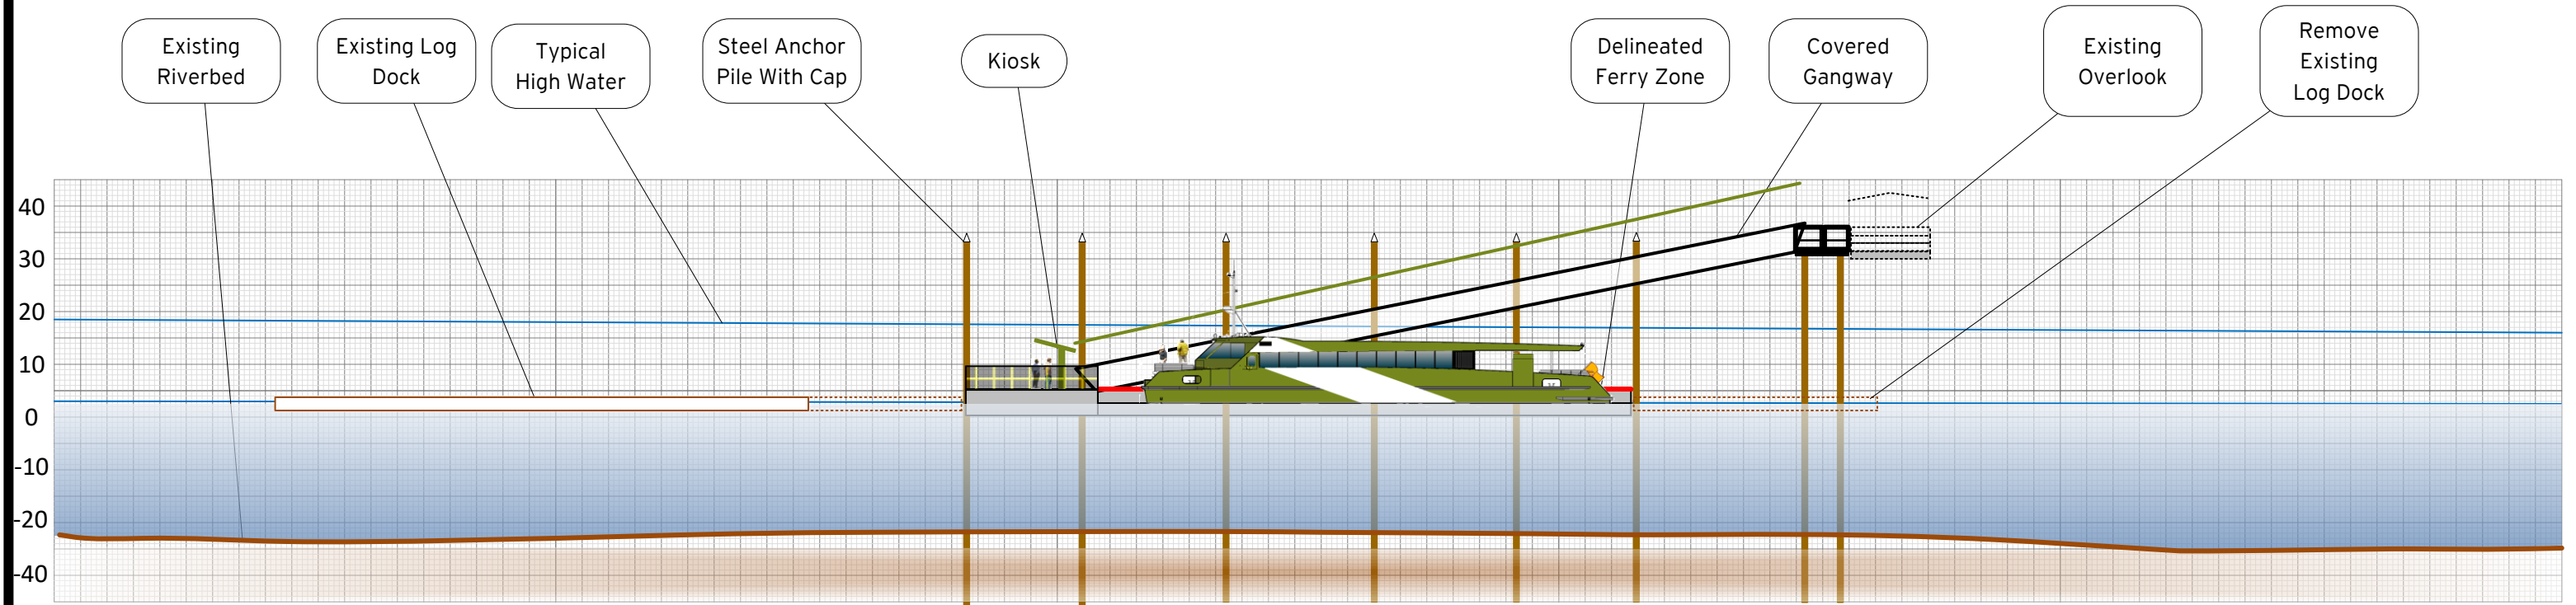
E.Plan - Lake Oswego Foothills Landing Plan(Alternate)
